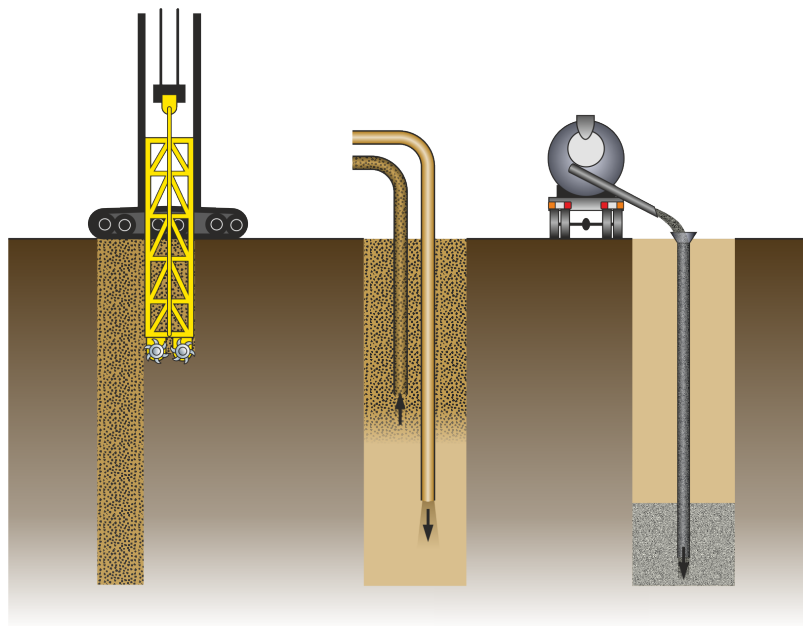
Overview of the construction of a slurry trench wall using a hydromill trench cutter (left) support fluid replacement (centre) and concrete placement using the tremie method (right) [11]
